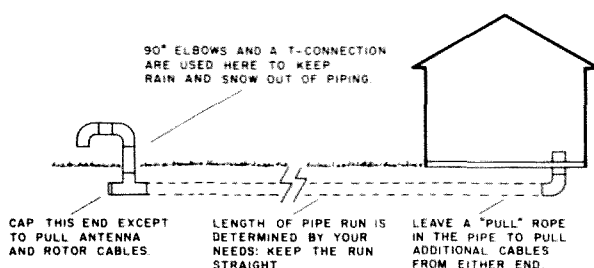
Details of PVC pipe arrangement which contains coax and control cables
